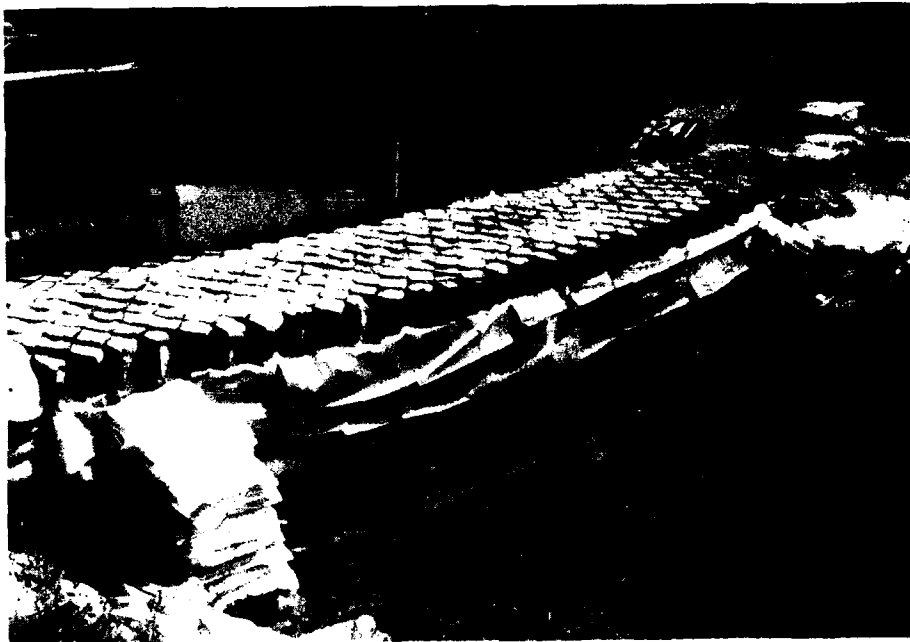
Landside view of Section 6-1 after 19 hr of wave action at the 4.0-ft water level
